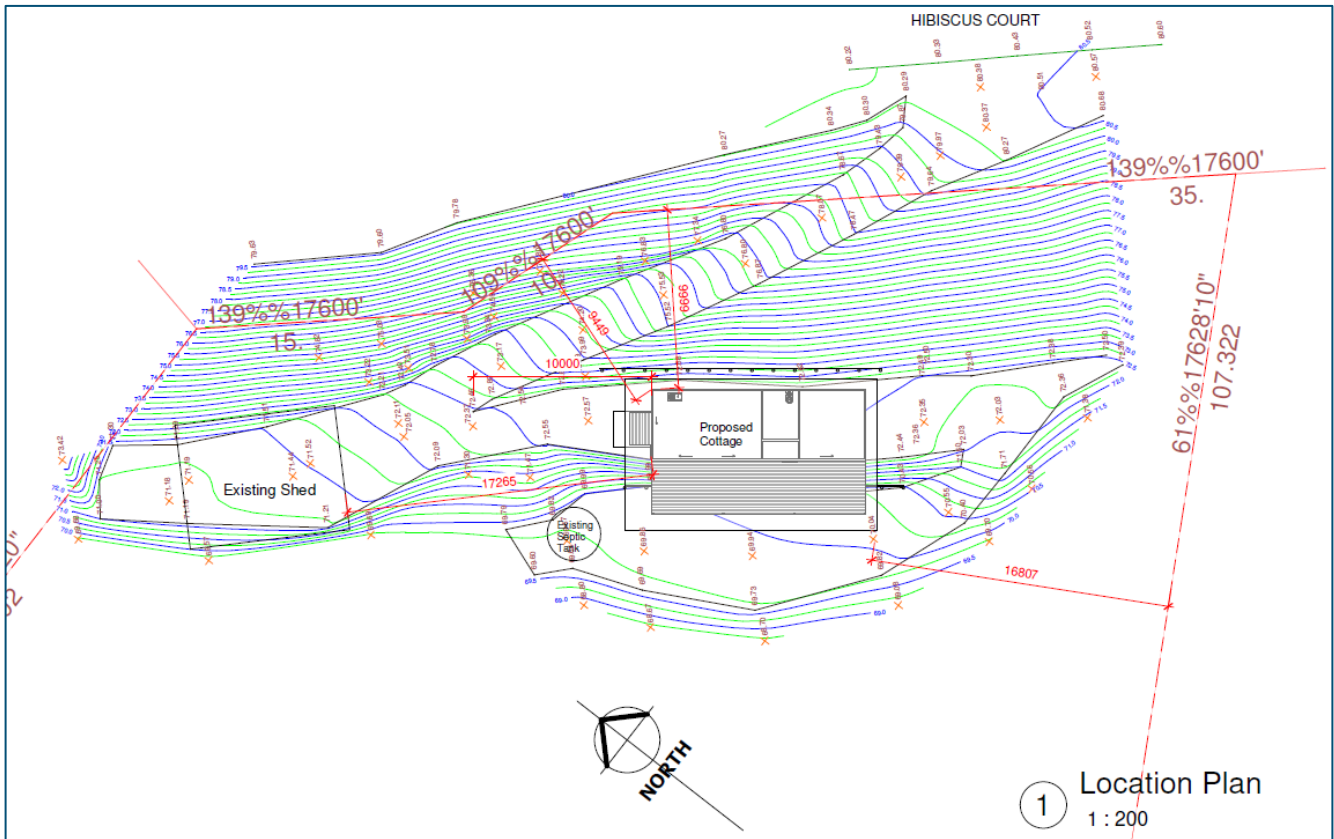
Extract from the Proposal Plans (source: Lawson Design)
